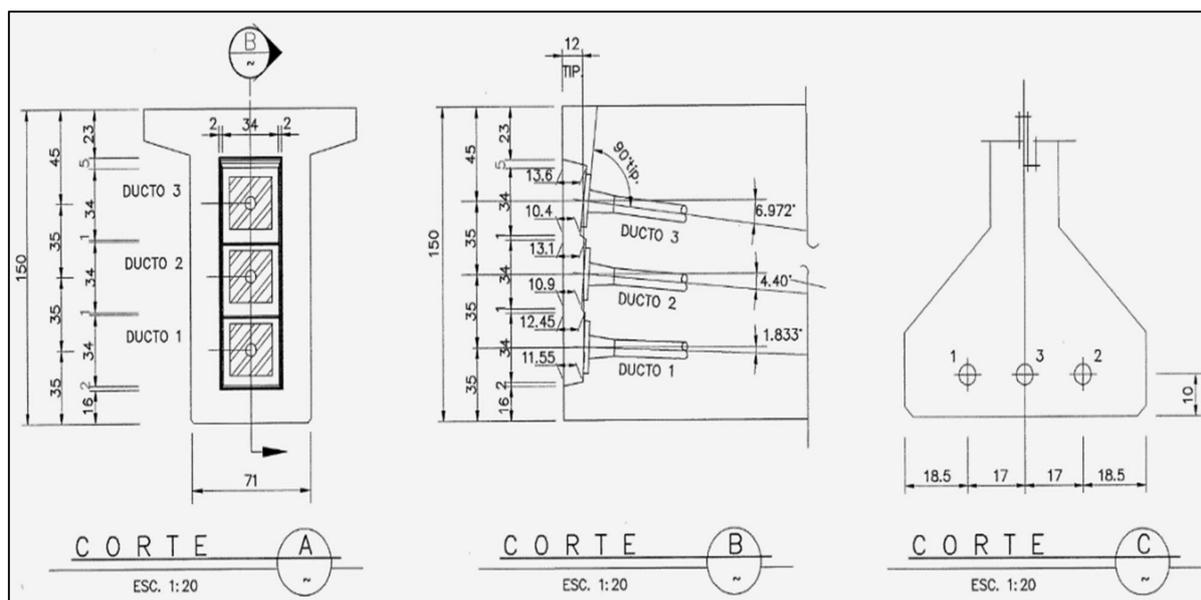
Original blueprint—pre-stressed girders on Guayacán bridge.
